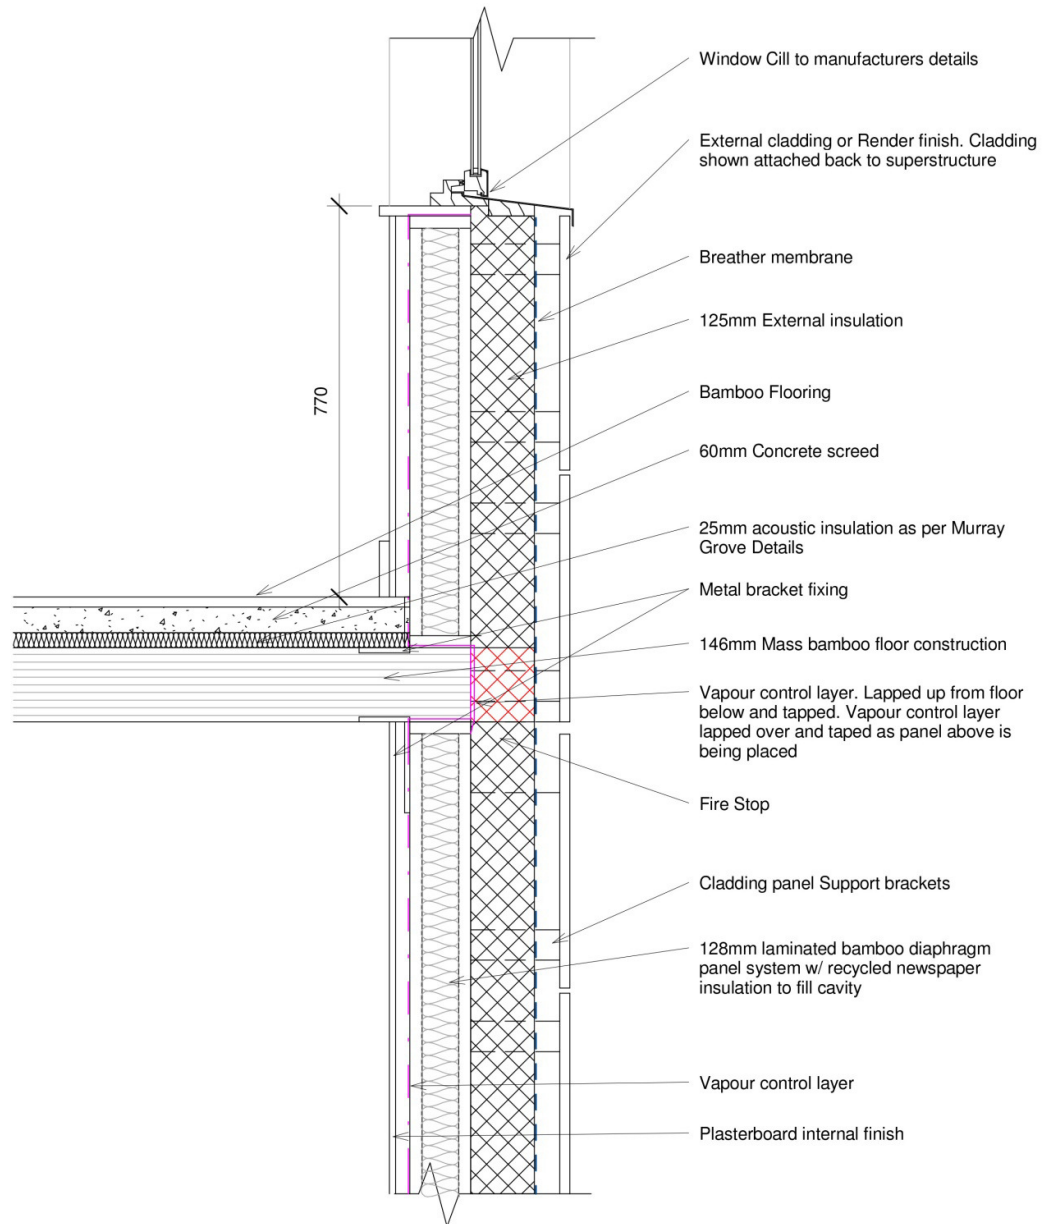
Construction detail A (not to scale) (Window Cill & Mid floor Junction) for LVB Panel system
